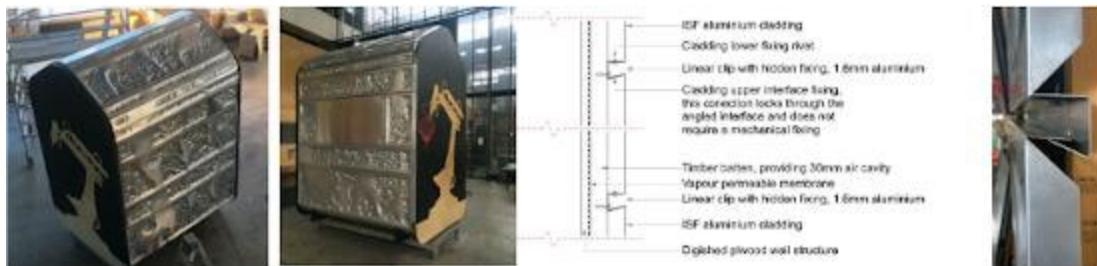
Completed DigiShed and details of panel system. (Source: Author)
